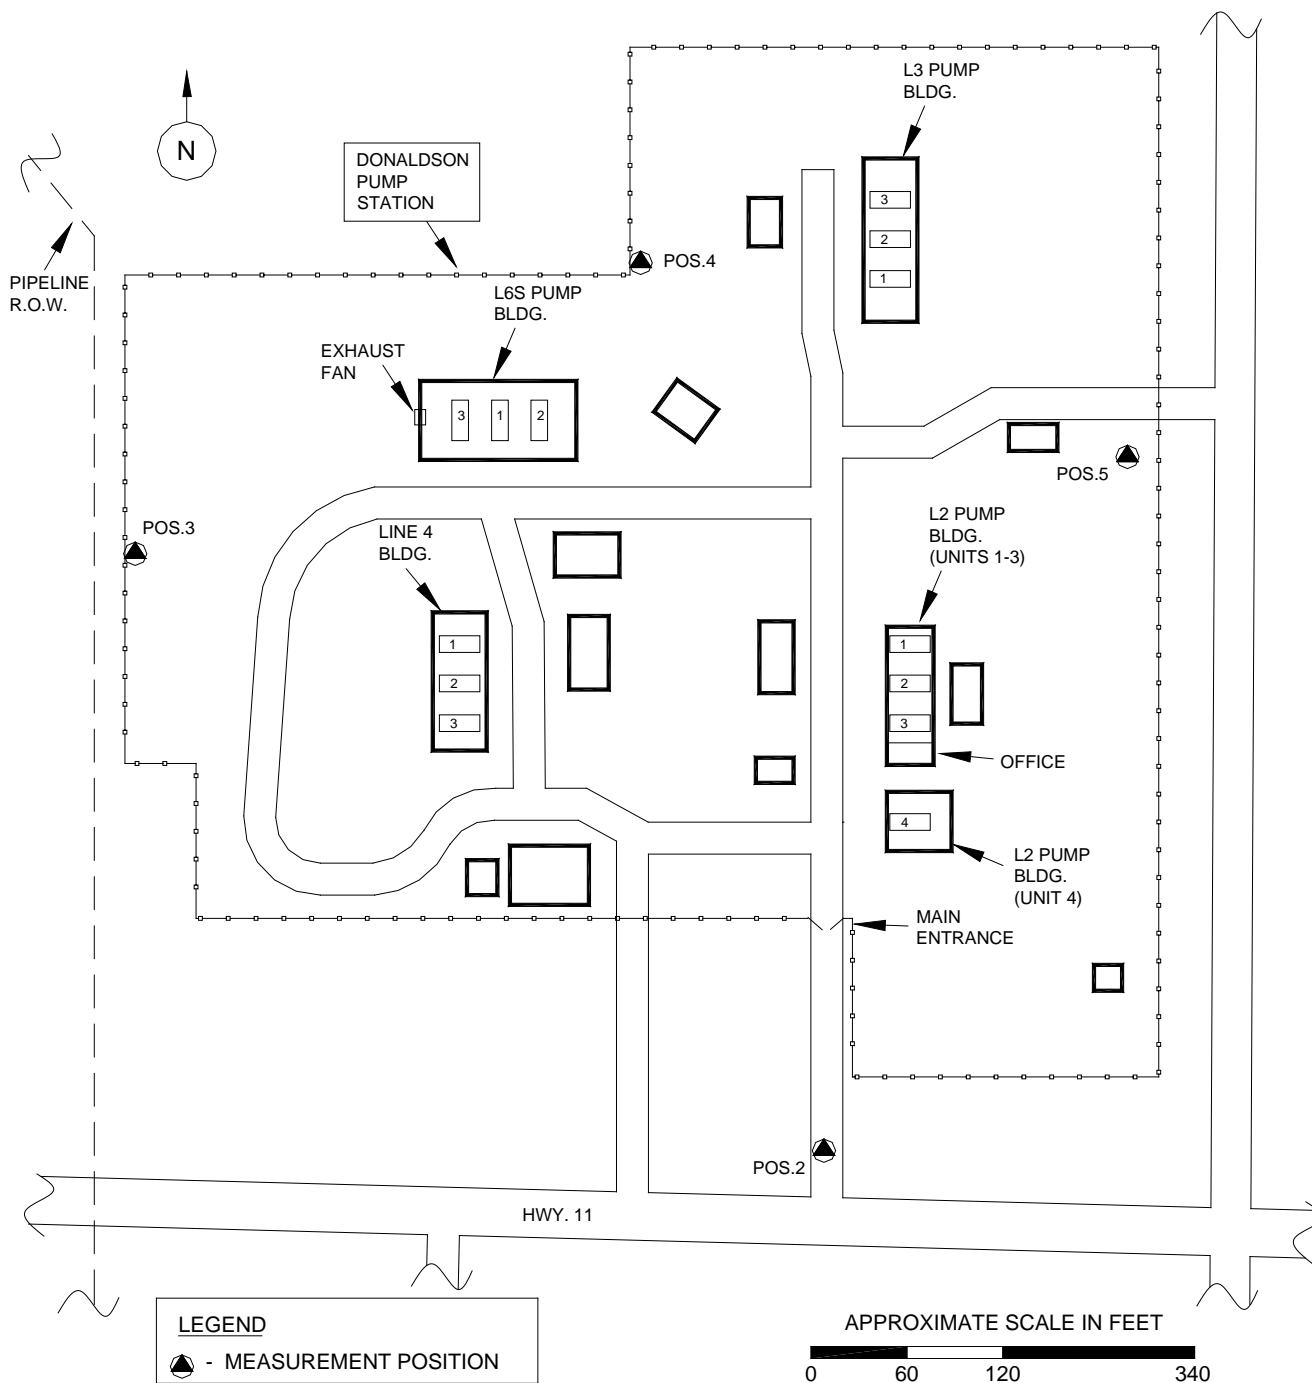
Enbridge Donaldson Pumping Station: Layout of the Existing Station and Conceptual Layout (Plot Plan) of Buildings/Equipment associated with new L67 Station along with the Location of Reported Sound Measurement Positions around the Station Property.
